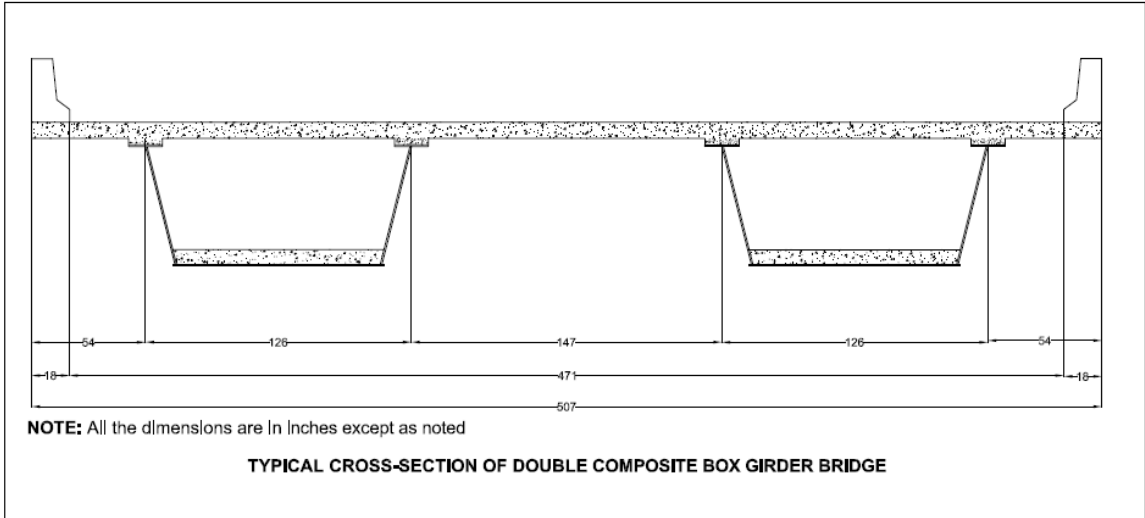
Typical Cross-Section of Double Composite Bridge
